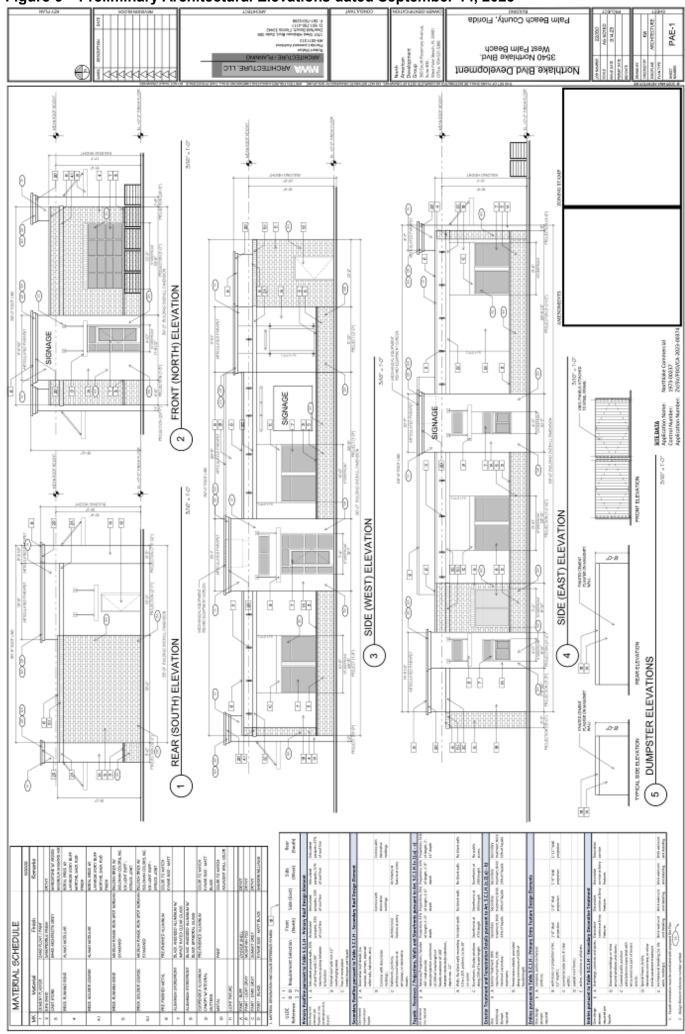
Preliminary Architectural Elevations dated September 14, 2023
